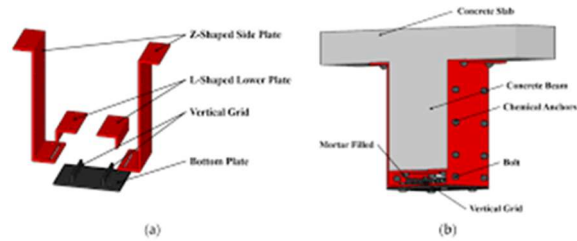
Steel Plate Retrofitting in Civil Engineering
